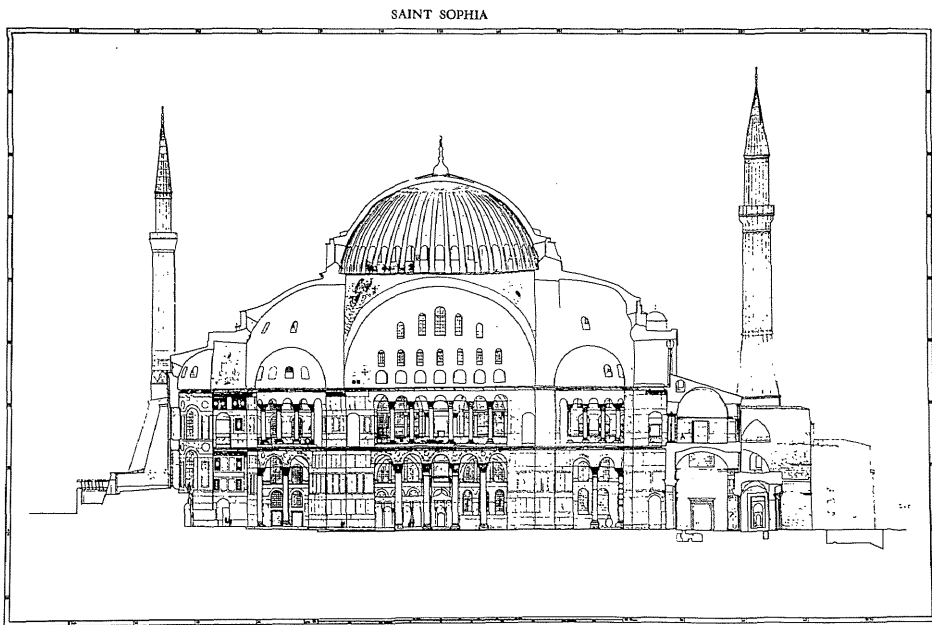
LONGITUDINAL SECTION, LOOKING SOUTH
